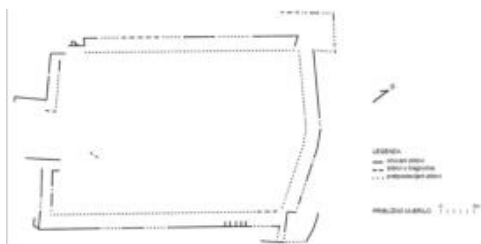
The layout of St. Mark's Castle, fully preserved walls, traces of walls and assumed walls are differently marked (graphic elaboration by Iva Petković Pavić, 2021)
